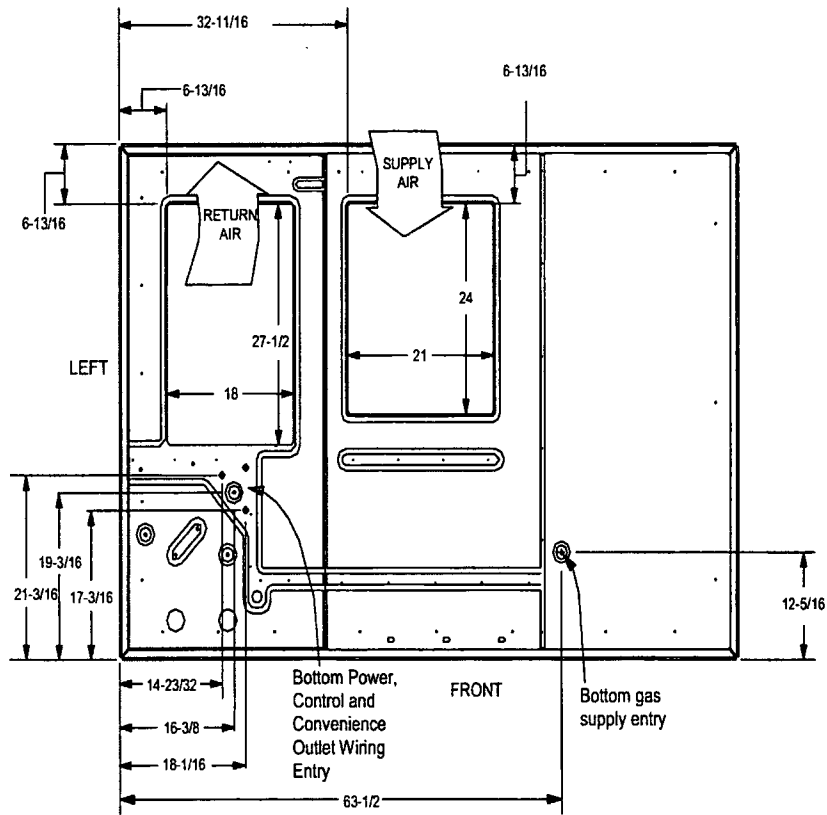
BOTTOM DUCT OPENINGS (FROM ABOVE)
